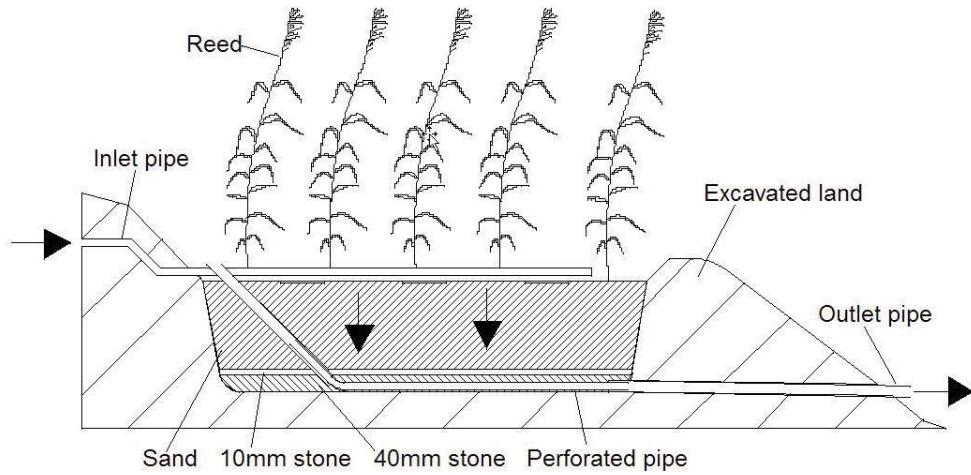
Longitudinal section of a compact vertical-flow constructed wetland
